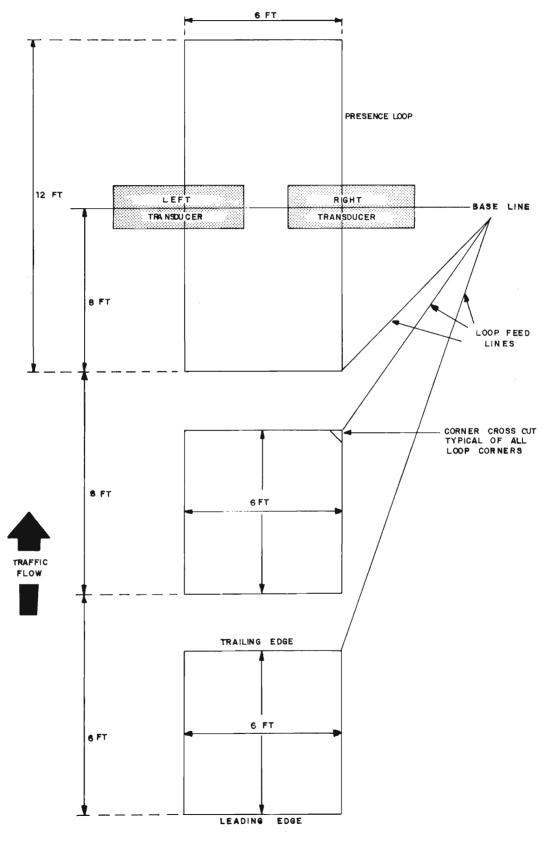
TRANSDUCER INSTALLATION LAYOUT
